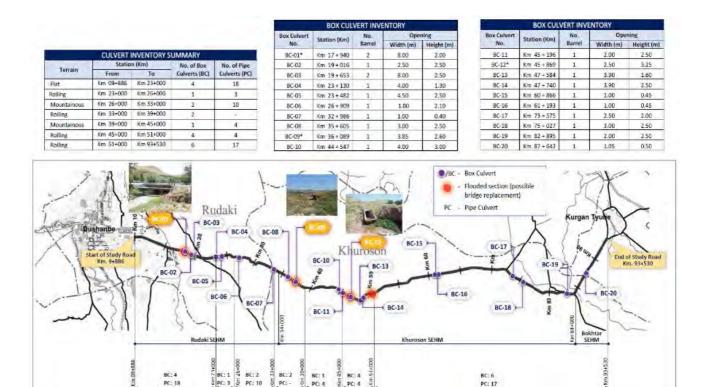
CULVERTS ALONG DUSHANBE – KURGAN-TYUBE ROAD
